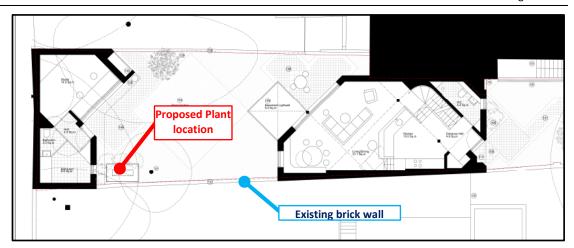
Proposed plant location (Image Source: Mary Duggan Architects)
